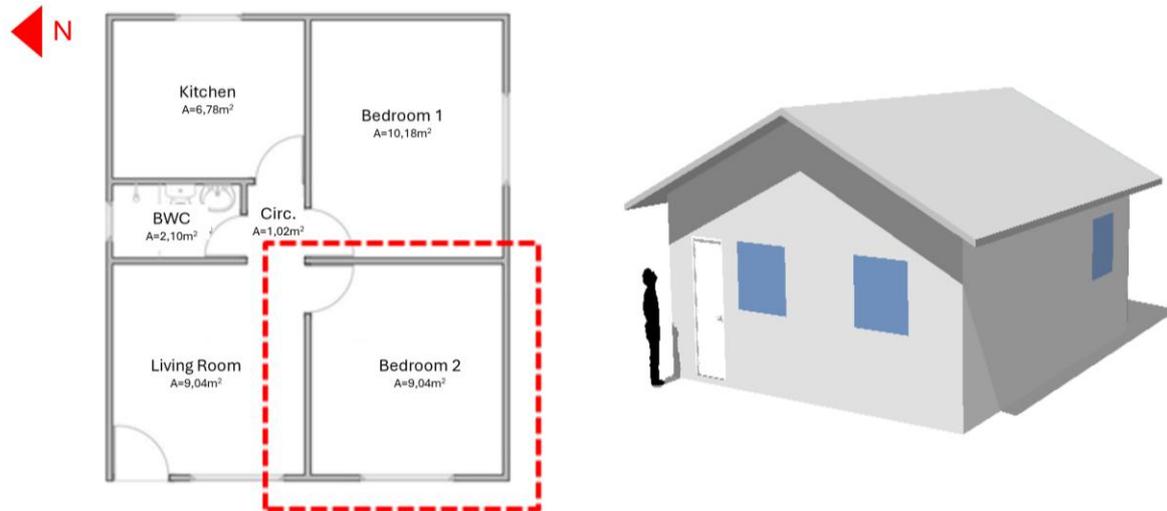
Floor plan and electronic model of the single-family building. Source: adapted [12].
